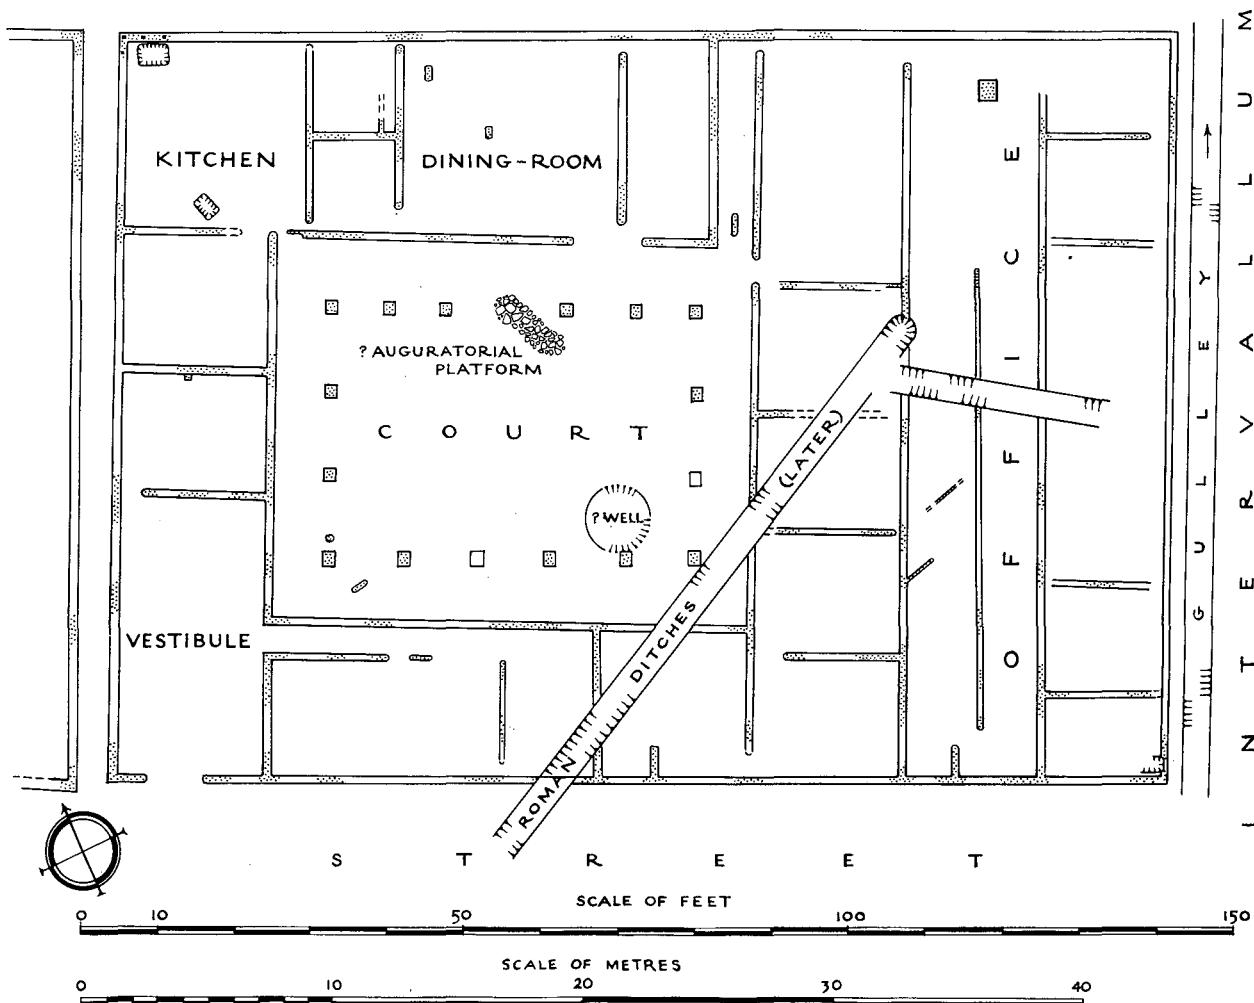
Tribune's House No. I, plan. Scale, 1:300.
